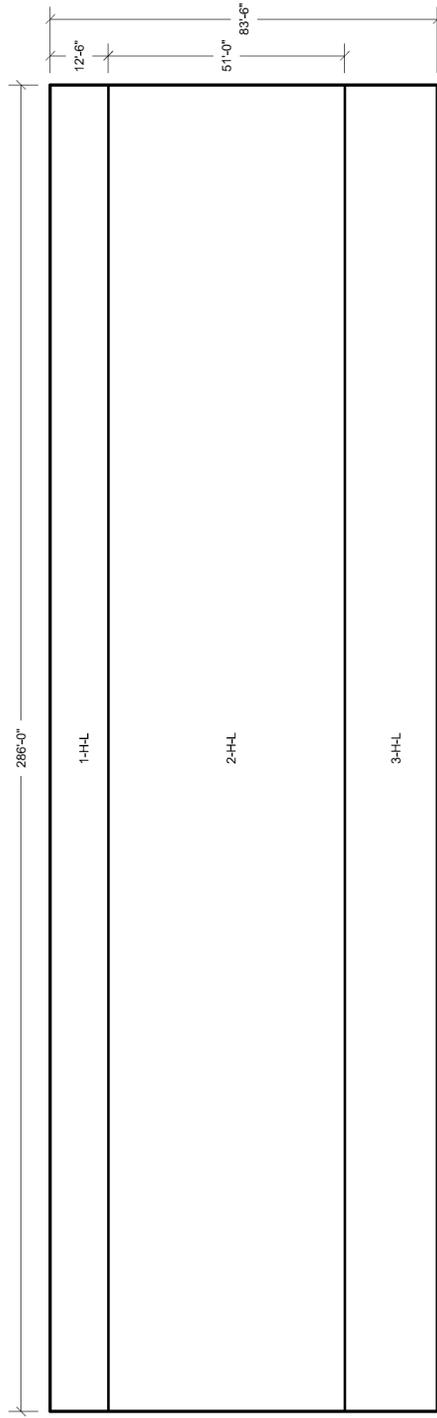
H.6-32: UHS BASIN NORTH WALL LOOKING SOUTH
